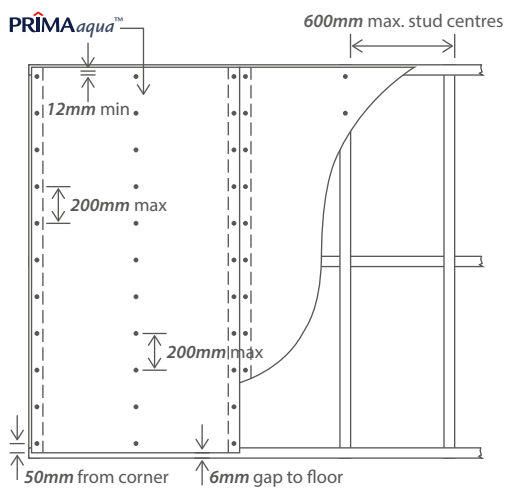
Vertical Sheet Fixing (Untiled Wall)
